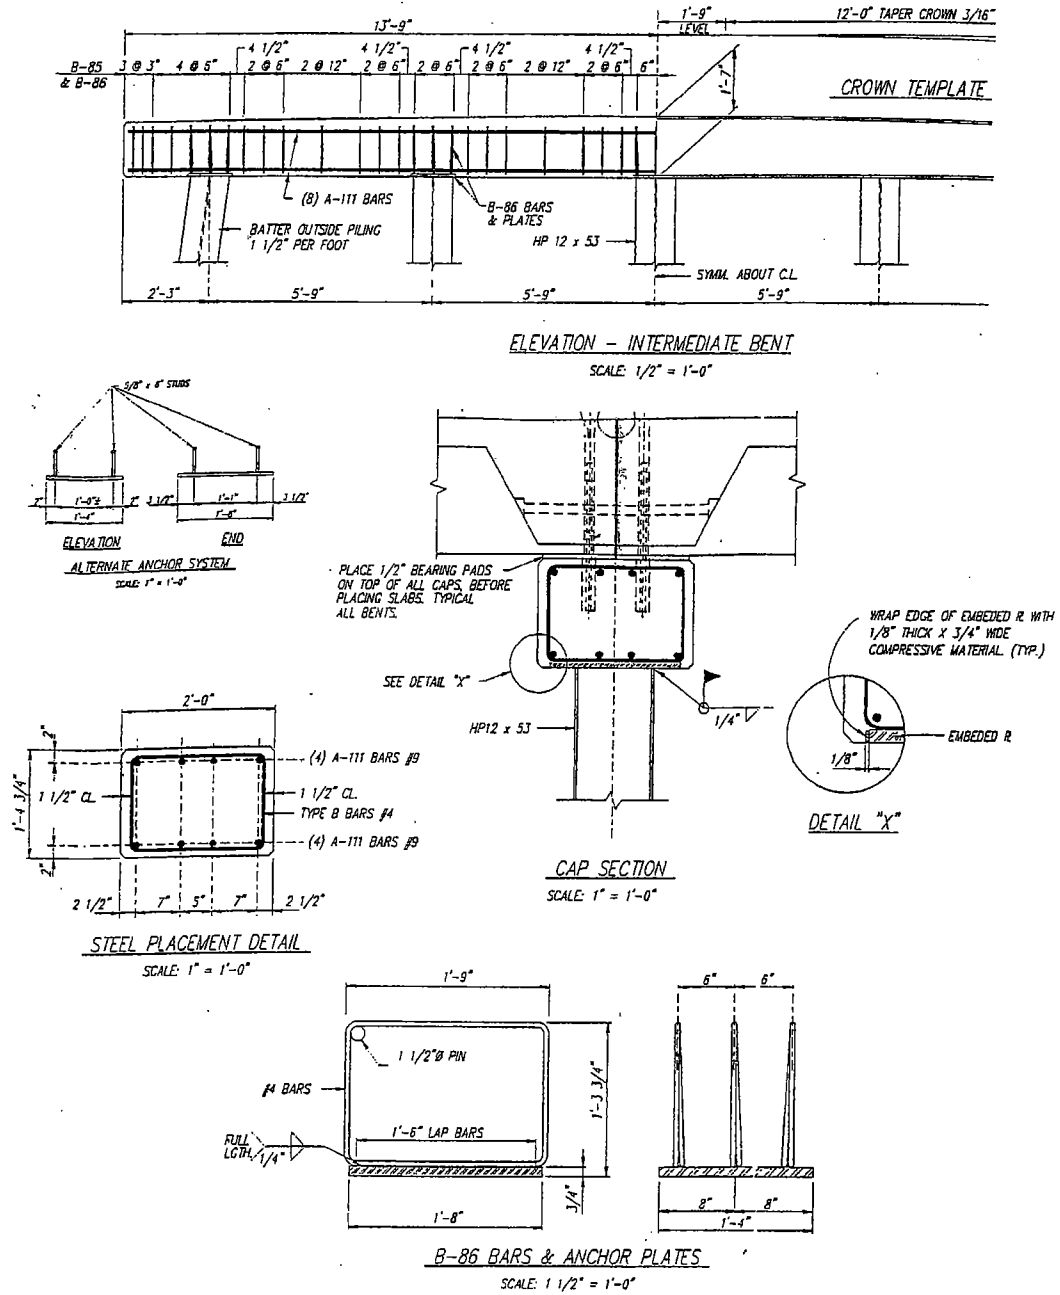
Pile Connections by Anchor Plates to Bent Cap (3)
